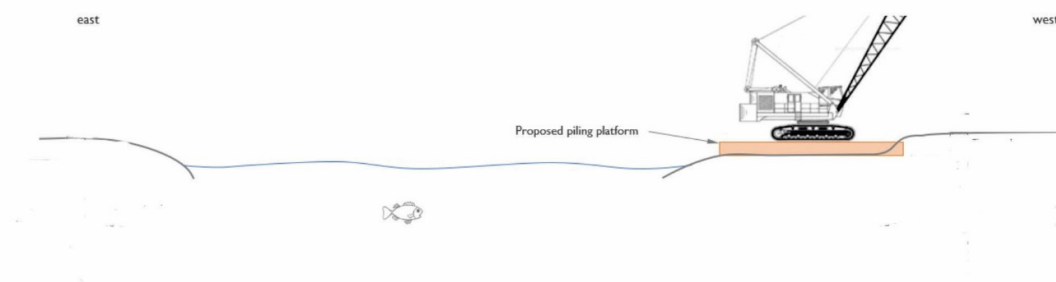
Sketch cross section before the development of an EGM for the temporary works.
